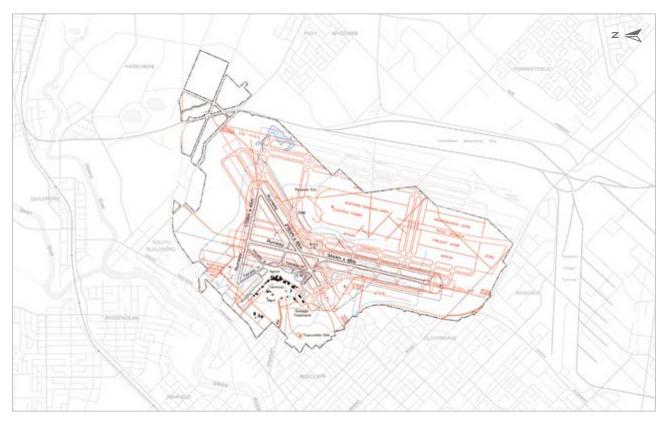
Master Plan 1985 runway configuration Source: Perth Airport Master Plan 1985 (Department of Aviation)
